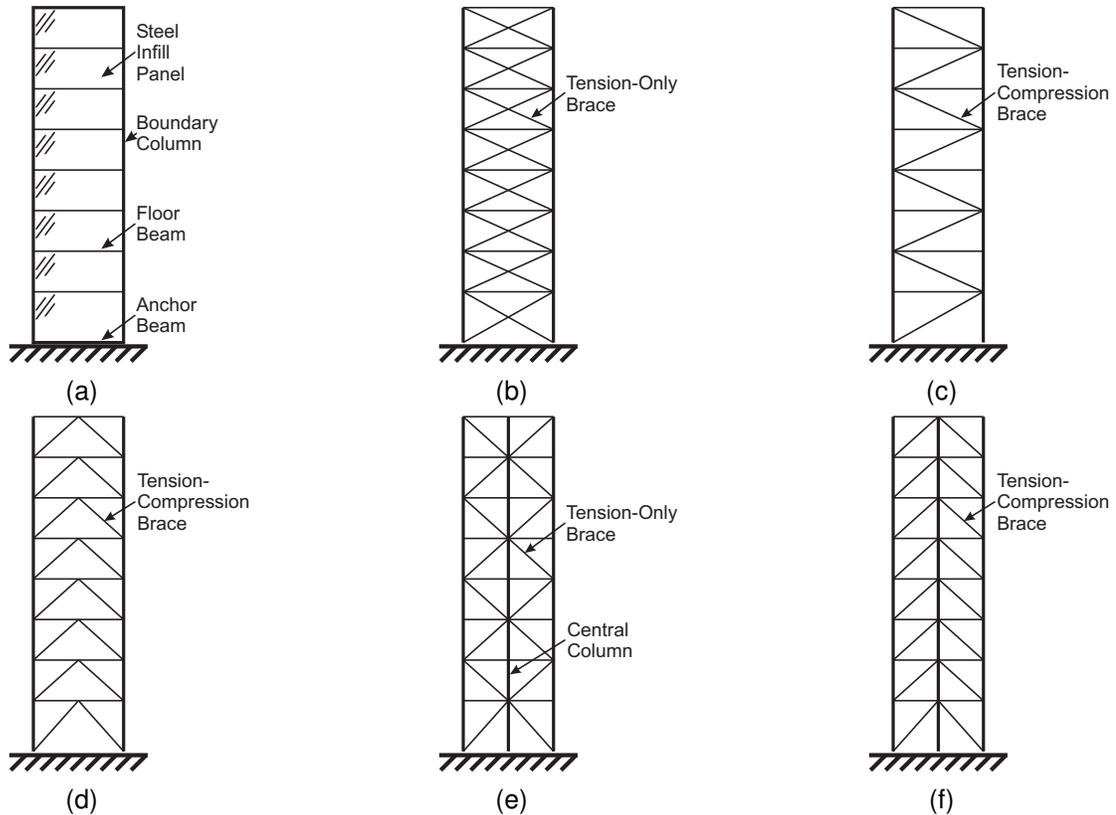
Schematic drawings of considered base-rocking systems: (a) steel plate shear wall; (b) vertical truss with tension-only braces; (c) vertical truss with tension-compression braces; (d) chevron-braced frame; (e) two-storey X-braced frame; (f) zipper-braced frame
